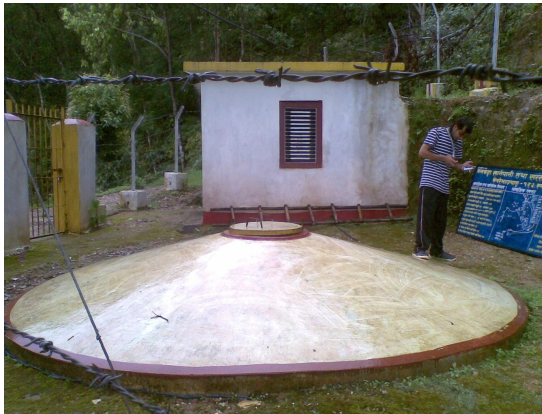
View of 1<sup>st</sup> RVT and Pump House; proper fencing done
